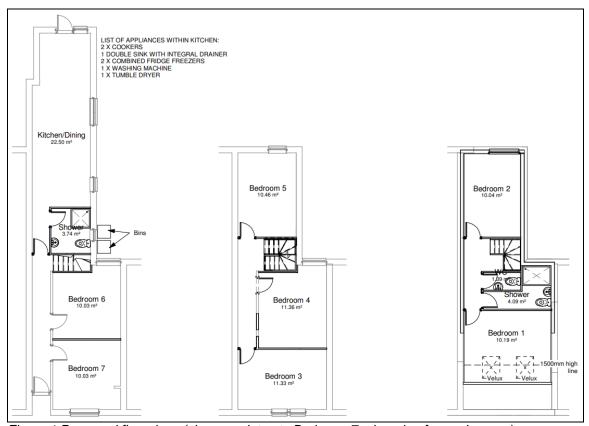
Proposed floorplans (change relates to Bedroom 7, changing from a Lounge)
